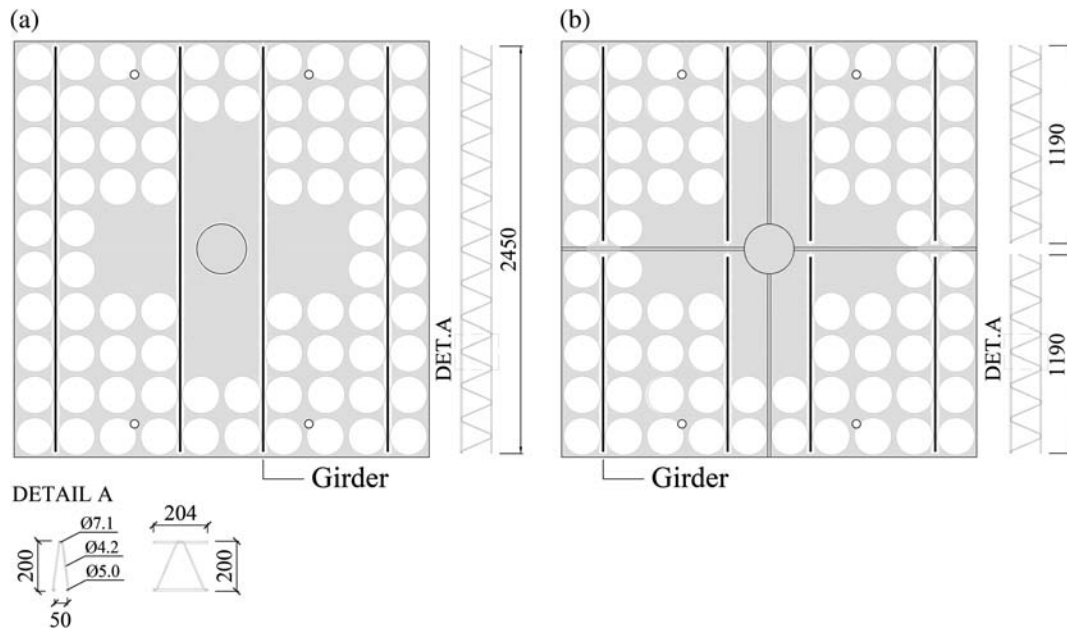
Disposition of the girders in slab: (a) *BubbleDeck* slab (BD), (b) BDP (dimensions in mm)
